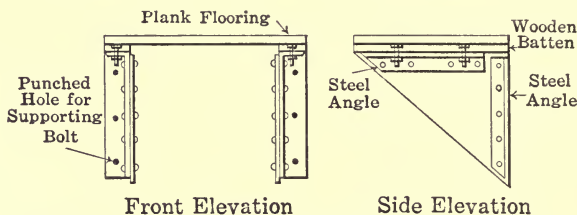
STRUCTURAL STEEL BRACKET SUPPORTS.
